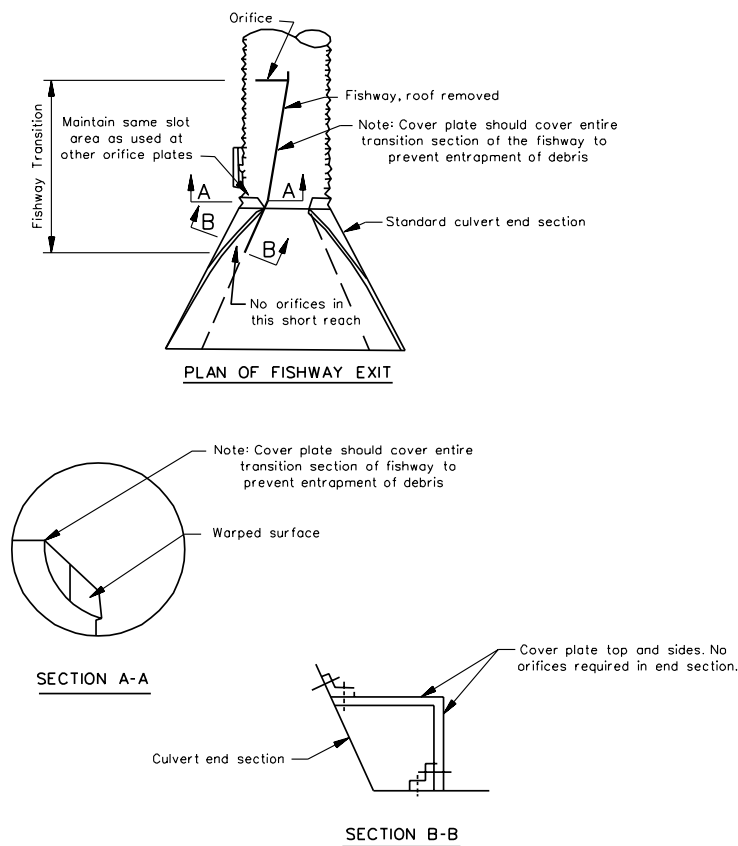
Preferred Entrance Arrangement For Fishway Exit Construction In Culvert Wingwall
